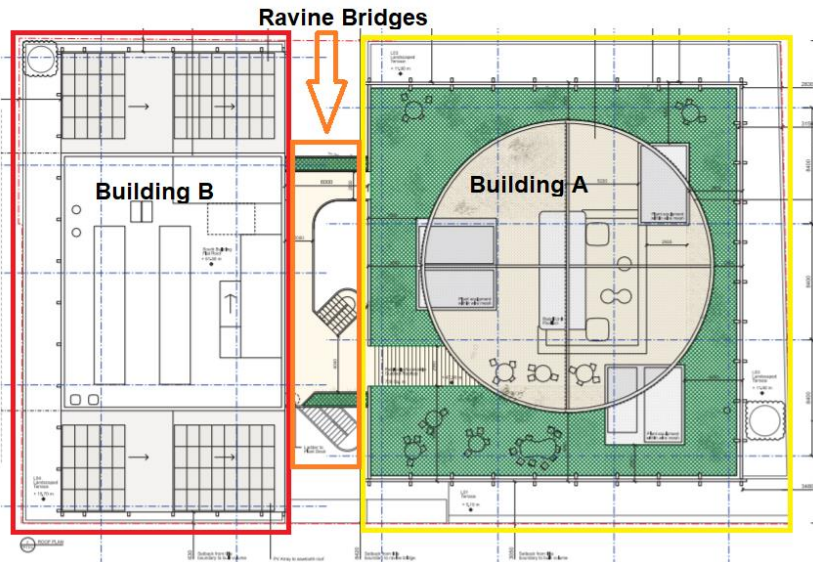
Portions / towers identified as Buildings A and B – Roof Plan.
